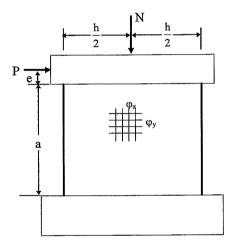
Shear wall with web reinforcement loaded by transverse as well as normal forces
